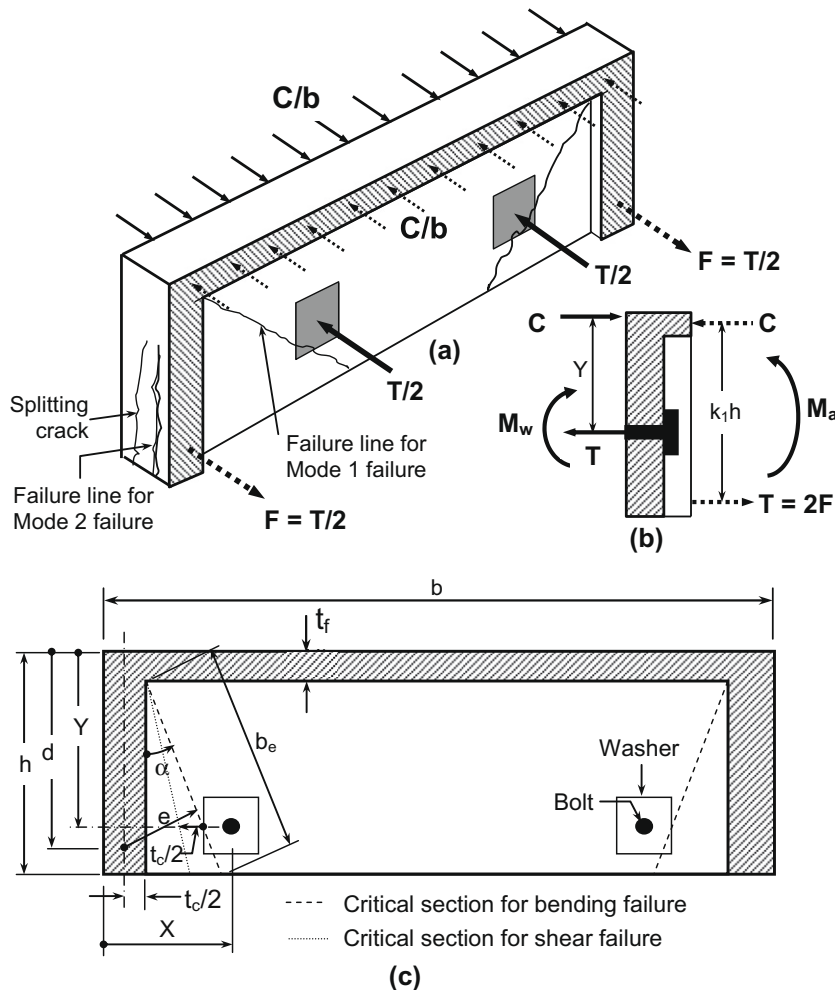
Modeling of failure for an opening joint: (a) Three-dimensional view of the joint showing the forces developed, (b) Transverse view of the joint, and (c) Critical sections for bending and shear failure.
